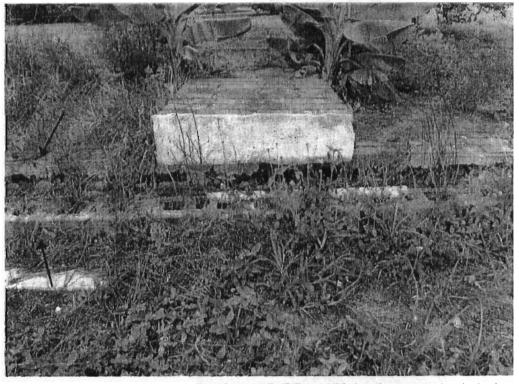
Another collapsed section of the privacy wall. Failure at this location occurred at the horizontal (bed) joint of the first (lower arrow) and second courses of masonry (upper arrow).
